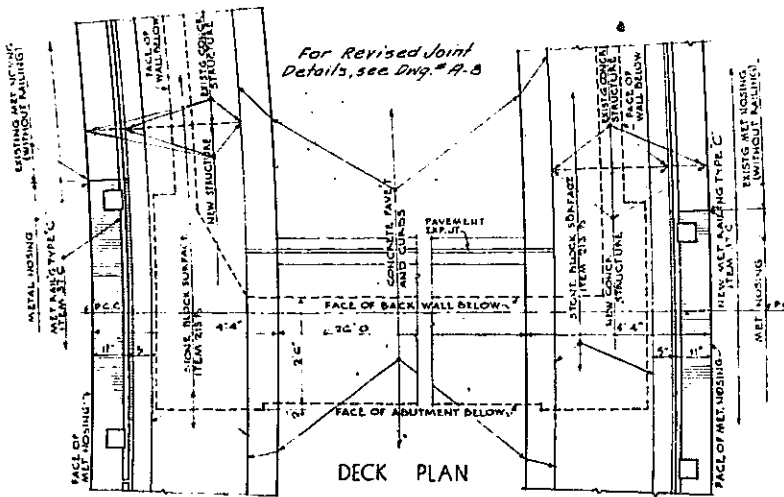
DETAIL PLAN OF NORTH CORNER OF ABUTMENT
